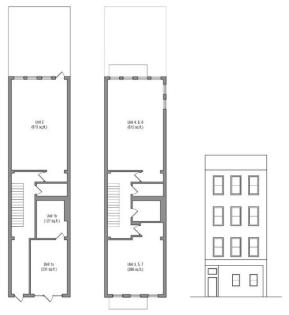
, 54, 55 (left to right): Building 1, first (ground) floor (1932); floors 2–4 (1932); street-front elevation (1983). For plans, north is up.
